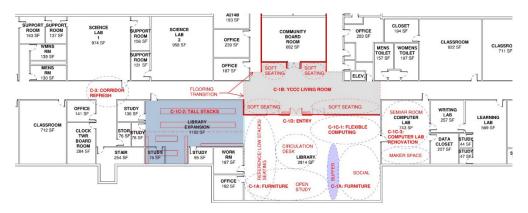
Library and Adjacent Corridor Renovations: Overall Plan Diagram
